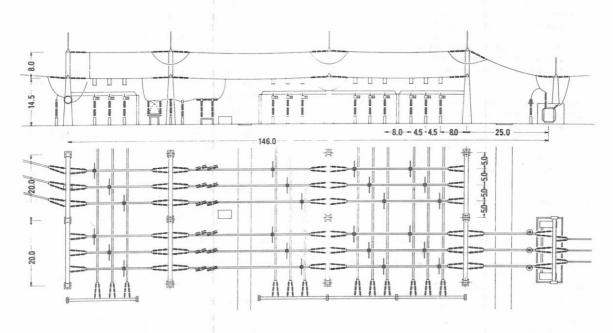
420 kV outdoor substation with triplicate bus and bypass; Dimensions in metres
